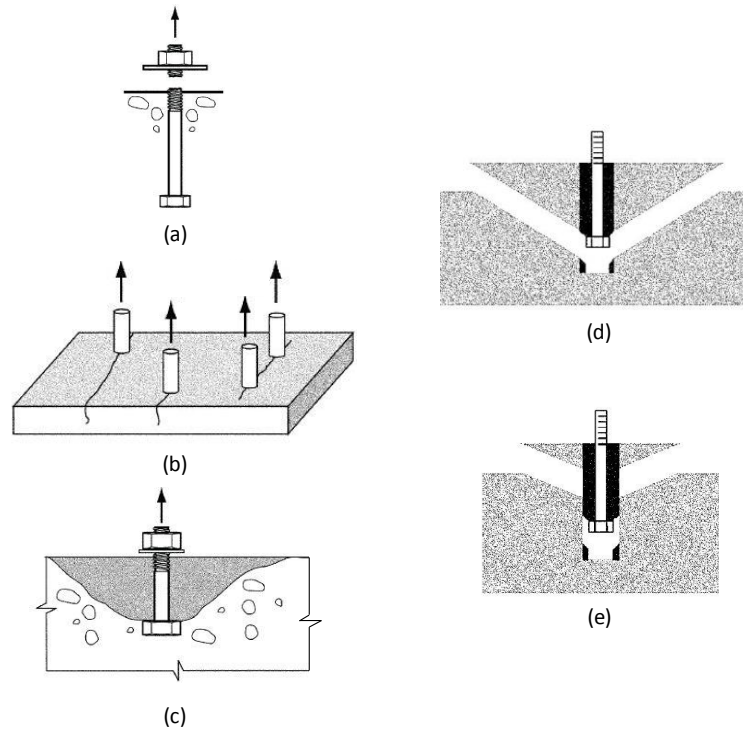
Potential failure modes for post-installed anchors. a) yield or fracture of anchor; b) concrete splitting between anchor locations; c) concrete break out cone formation (undercut anchors); d) concrete break out cone formation (grouted anchors); e) bond failure at the grout/concrete interface.^{9,12}
